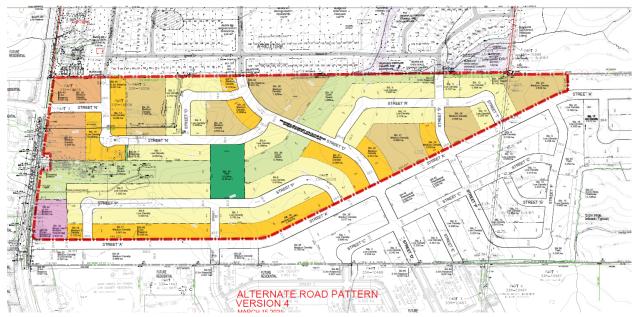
Excerpt of draft plan of subdivision (Source: MHBC, March 2021)
